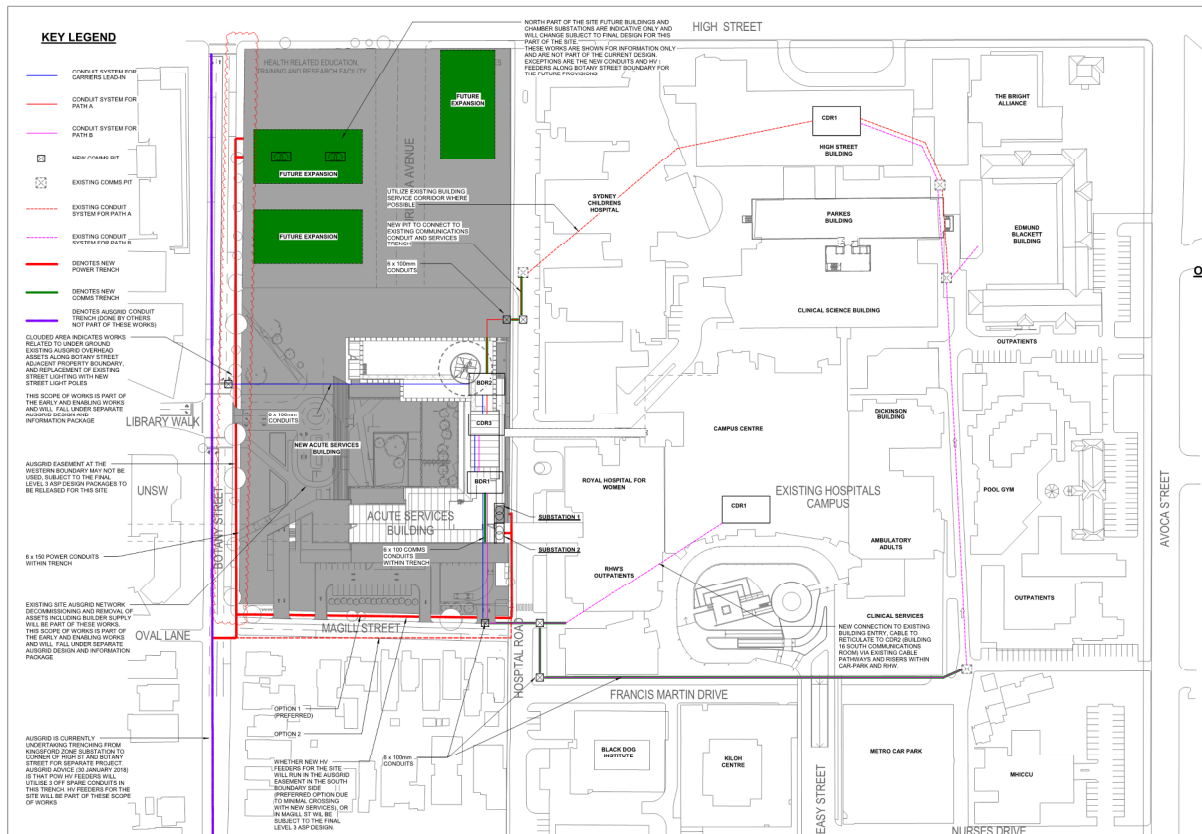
Site Plan Proposed Telecommunications Infrastructure
